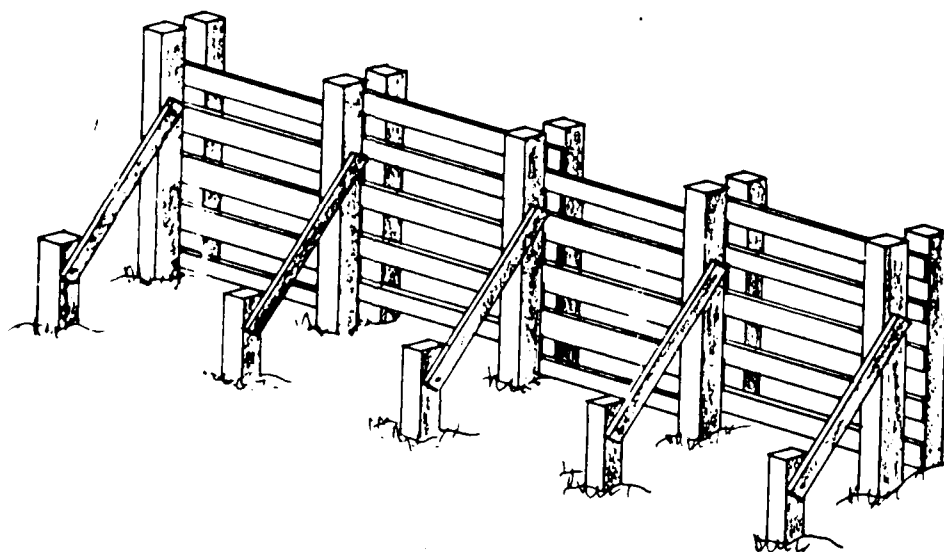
Wooden fence constructed parallel to bank (Source 4)
